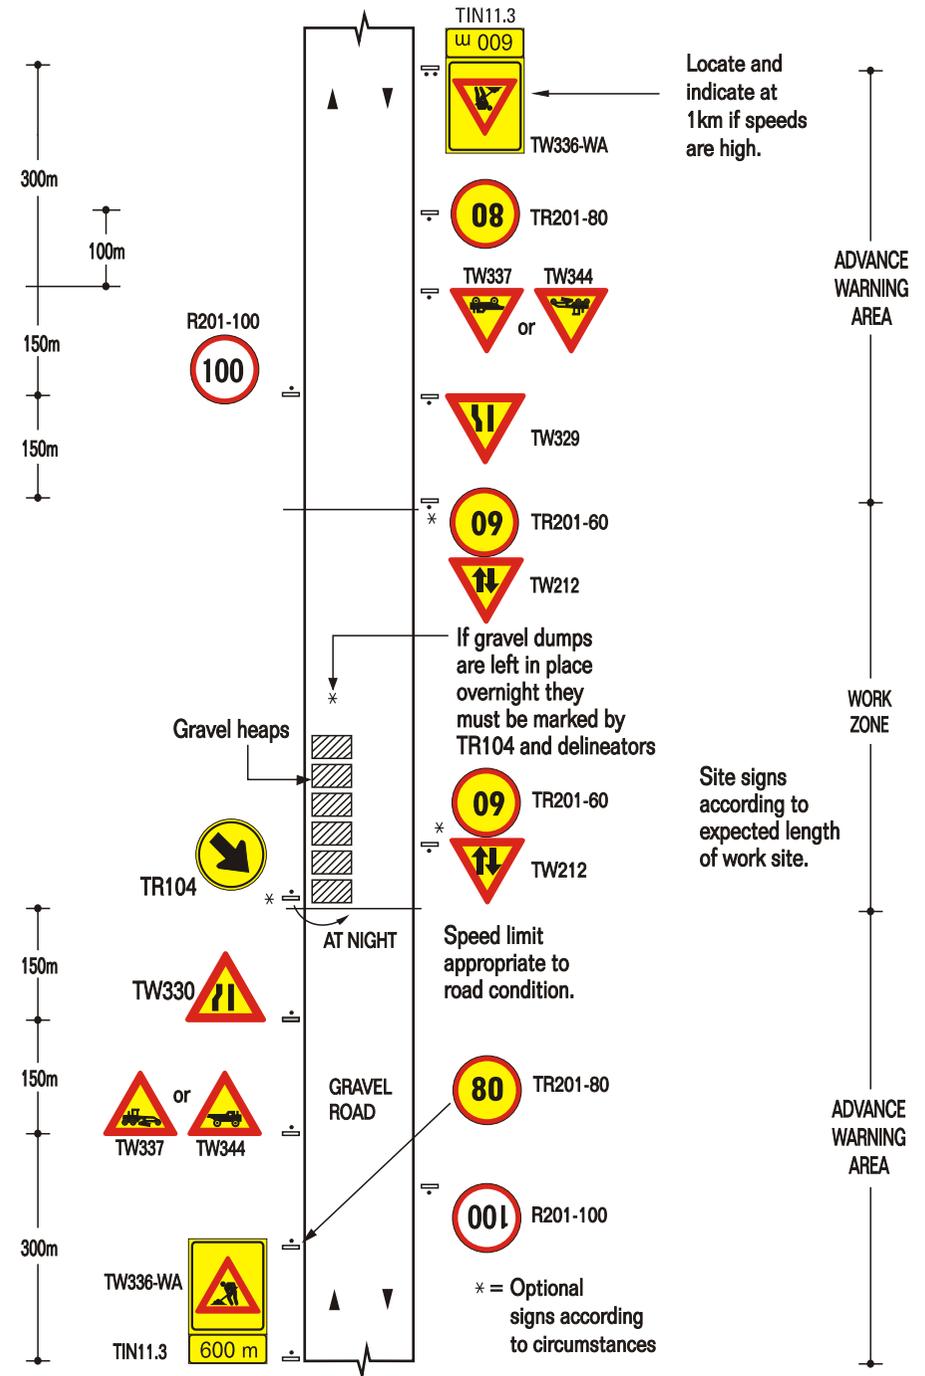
Gravel Road Reconstruction - Gravel Heaps Before Spreading
